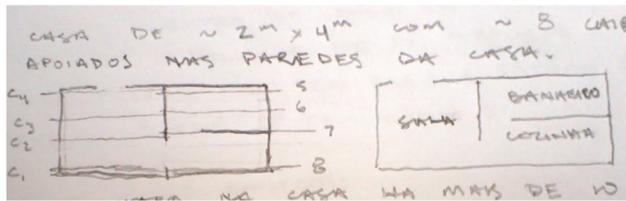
Author's notes, 2014. "Home of ~2×4 m. with ~8 rafters resting on the walls of the house. Interior plan: room, bath, kitchen"
